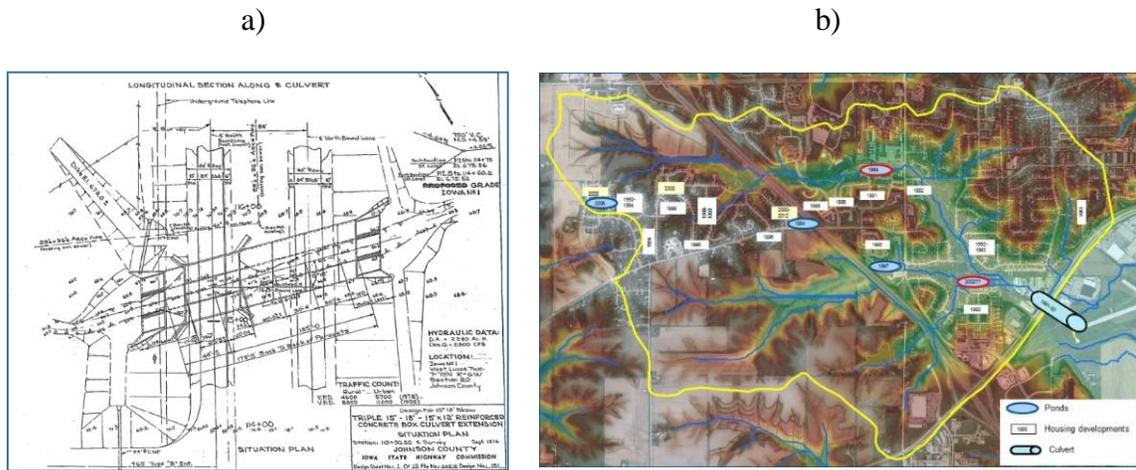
a) Construction drawings for the culvert for monitoring; b) drainage area for the culvert
